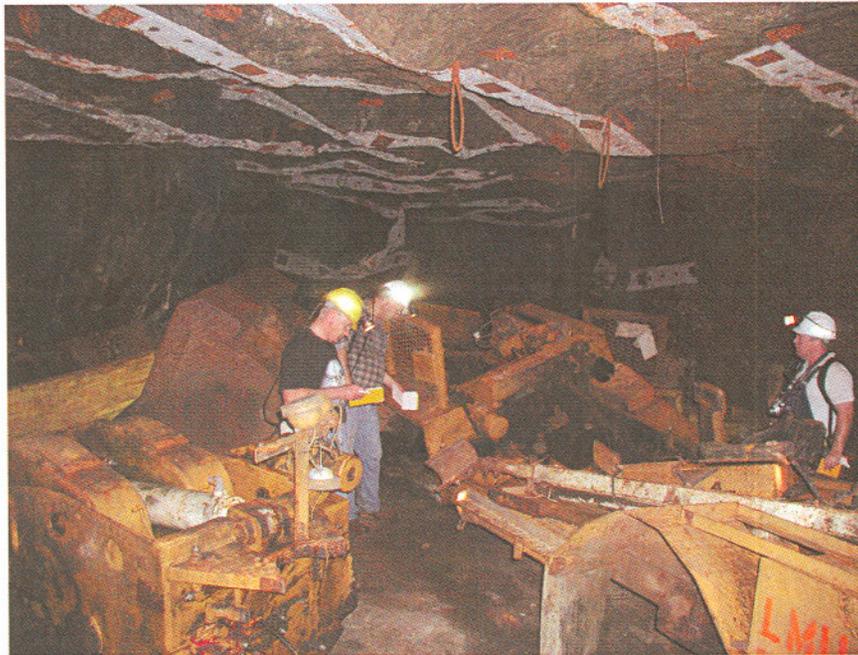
4850 100-foot subsill equipment bone yard. Abandoned in place.
